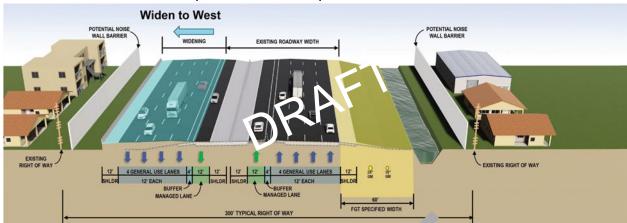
Typical Section Segment 2 - Build Alternative / - Widening to the West
